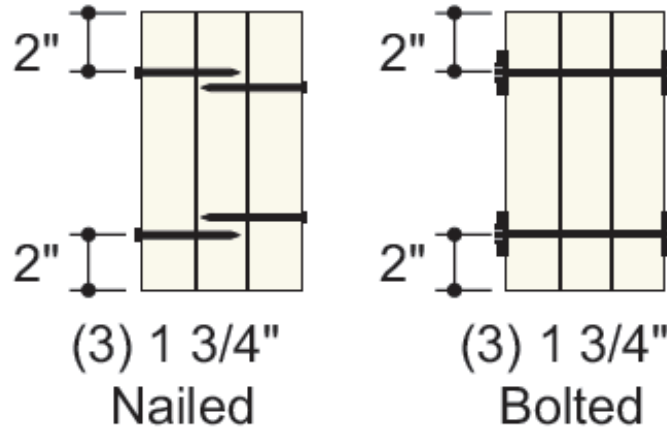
ASSEMBLY B (3-PLY BEAM)
